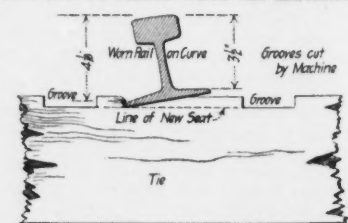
Tie Grooved by the Tie-Spotting Machine.
